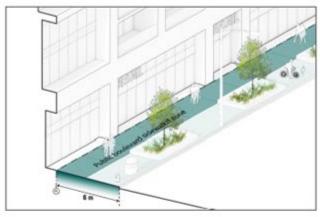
Illustration of commercial frontage with a generous sidewalk zone to support an active frontage and vibrant pedestrian environment.
